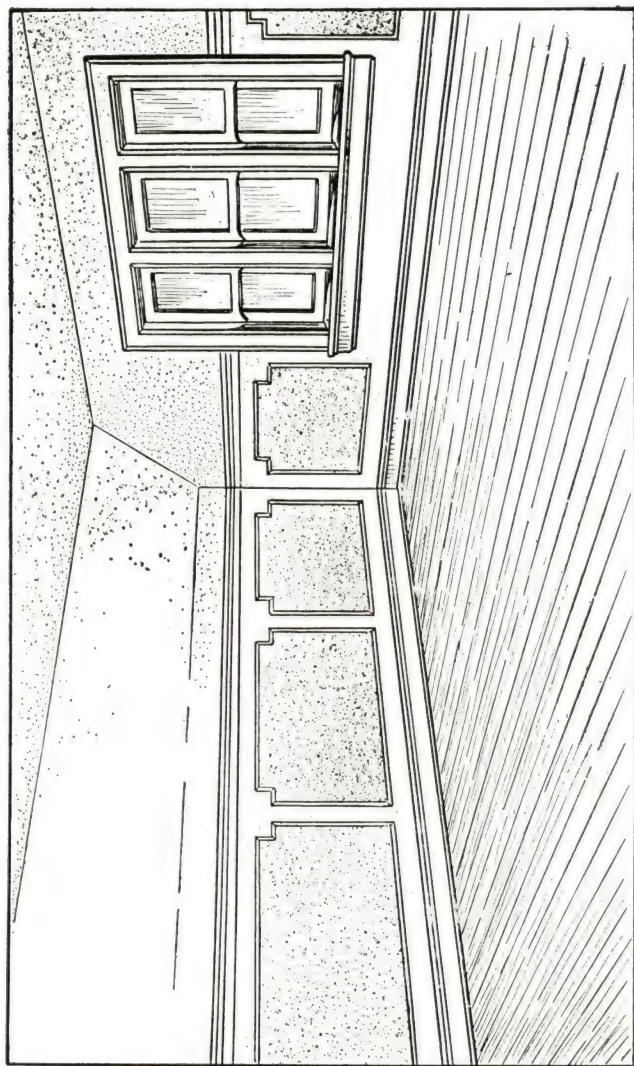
A Layout for the Handling of Wall Panels in a Second-Story Bedroom.
